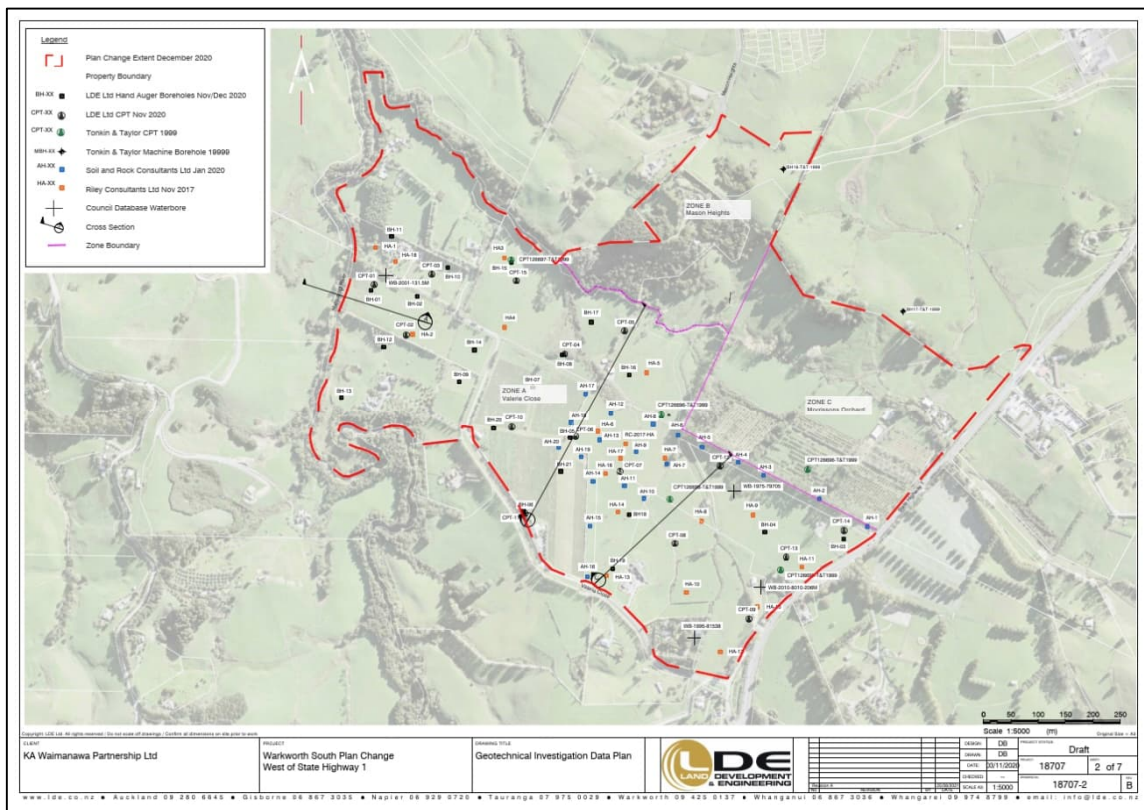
Geotechnical investigation plan denoting Zones A, B and C.
